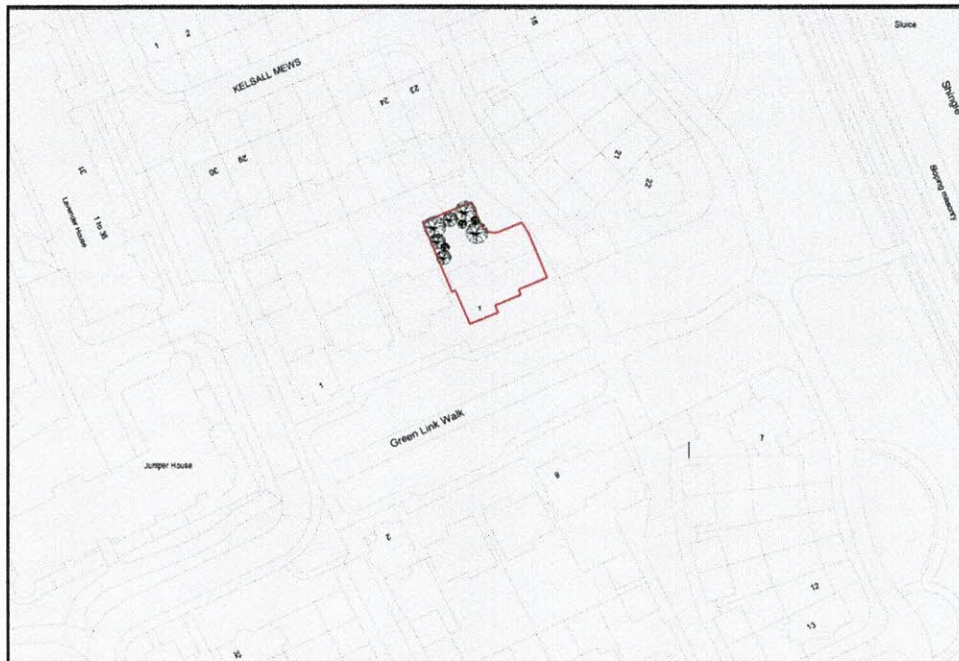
Site location plan (Source: Ordnance Survey, 2014)
